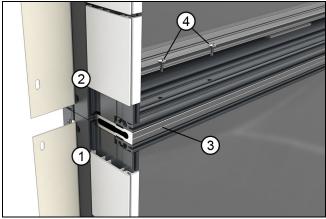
Horizontal mull (framing not shown for illustrative purpose)
